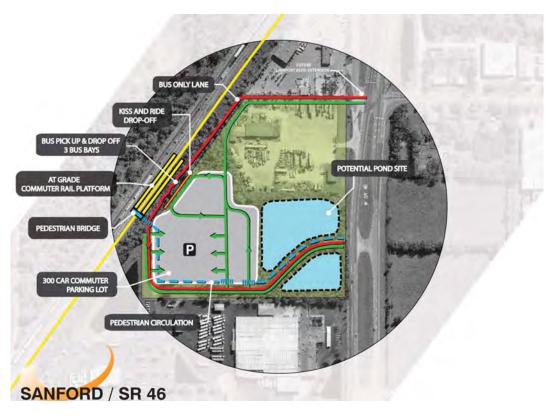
Conceptual Station Site Plan – Sanford/SR46
